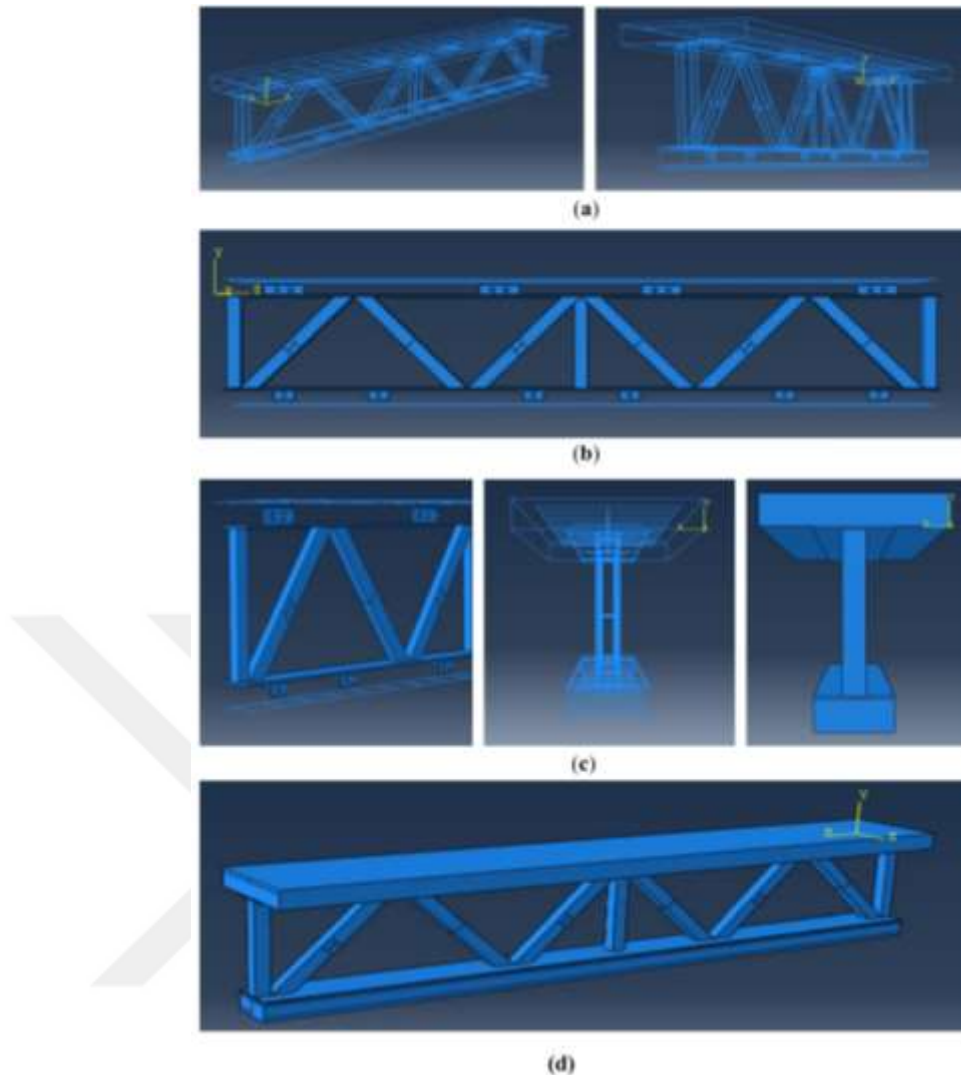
Double Composite Specimens after Assembling. (a) Top and Bottom Berfobond Leiste with the BRC 300x150X6 mm and 150x150x6mm, (b) Double Composite Specimen Side View With Shear Connectors, (c) Front View of the Double Composite Truss Girder and Plate Holes Reinforcement Bars, (d) 3D Model of the Double Composite Truss Girder
